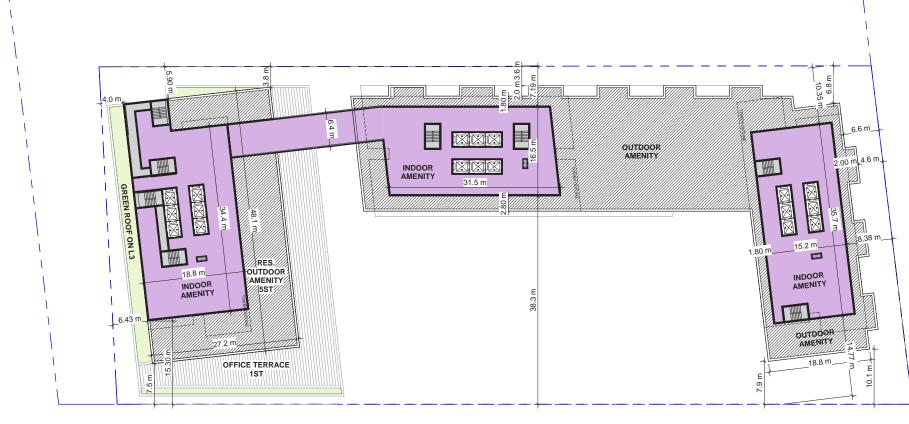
Level 6 Floor Plan (Prepared by: Sweeney & Co.)
